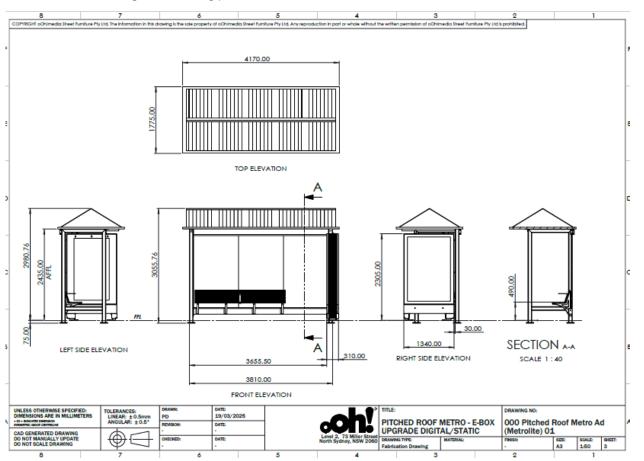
Proposed Digital/Static Signage Elevation – Pitched Roof Metro
